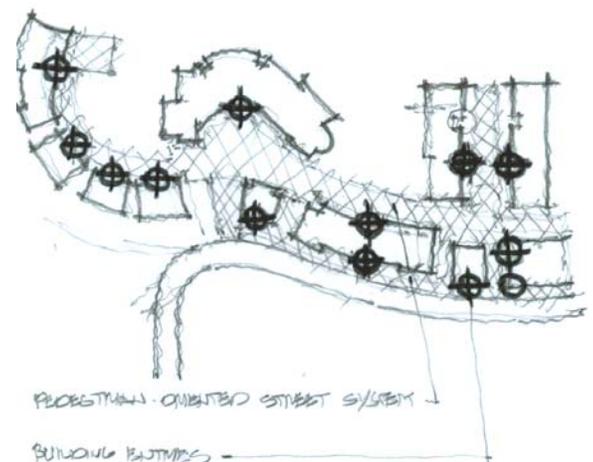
Primary building entrances shall be oriented towards an adjacent streets or public plaza, depending upon the building's context.
